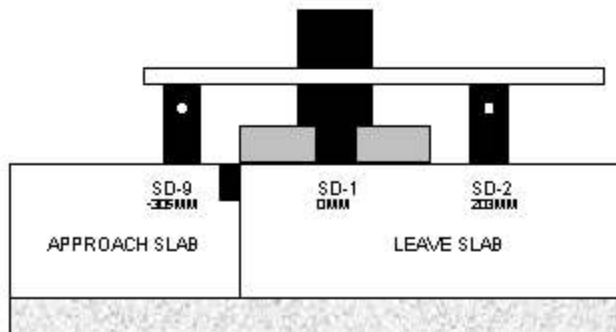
LEAVE SLAB LOAD TRANSFER
